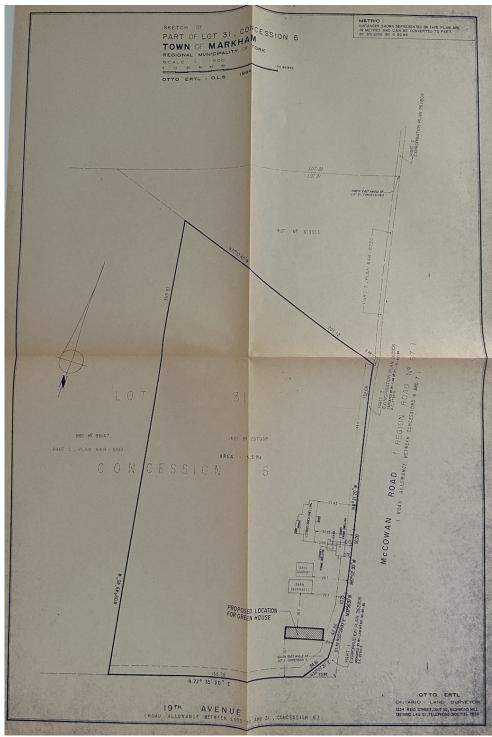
Overall site plan of 11534 McCowan Road, Markham, circa 1994. (Otto Ertl, OLS)
